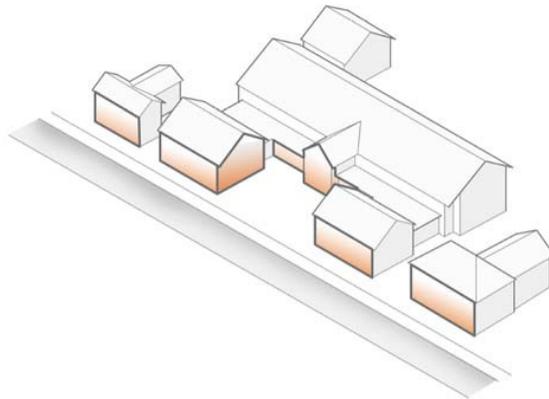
Chestertown, MD – Street walls, Source- Author, 2014
